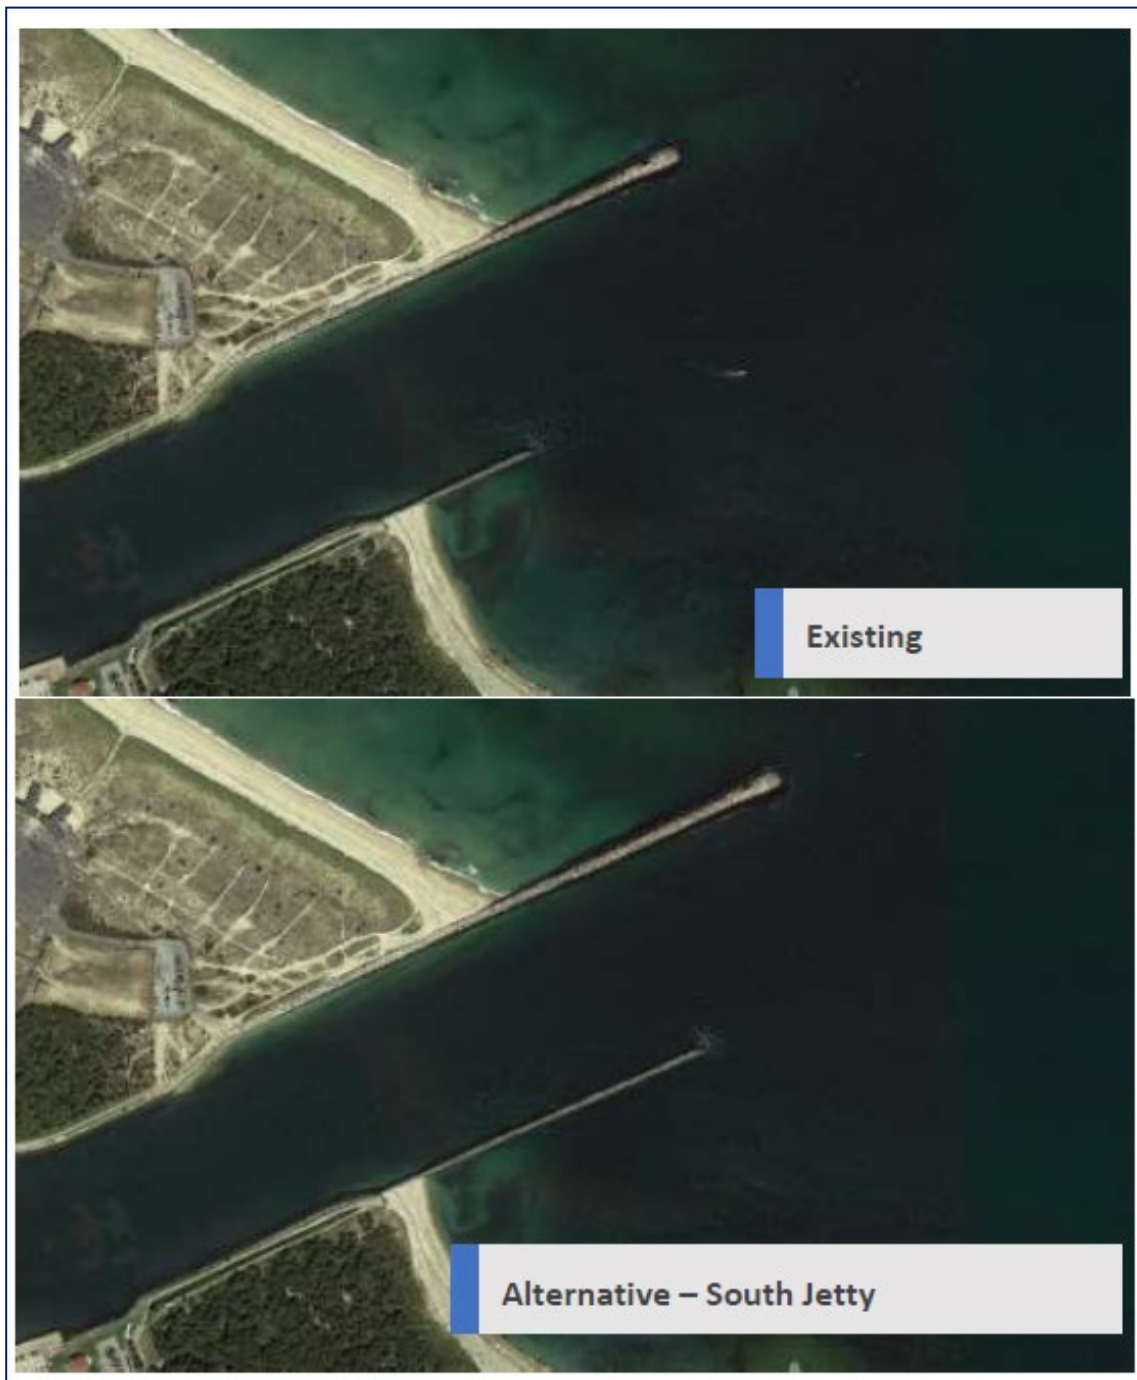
Plan view of Alternative 5 – South jetty lengthening (WHG, 2020)
